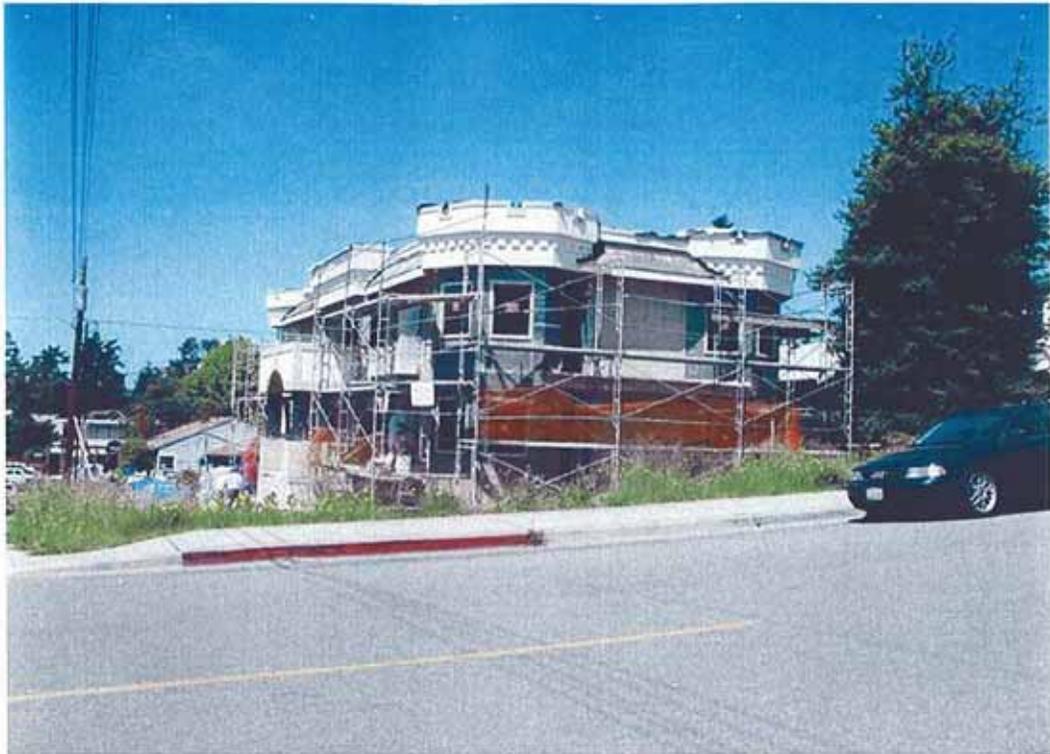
RS 5.0 zone; Norkirk Neighborhood; FAR: 0.57
